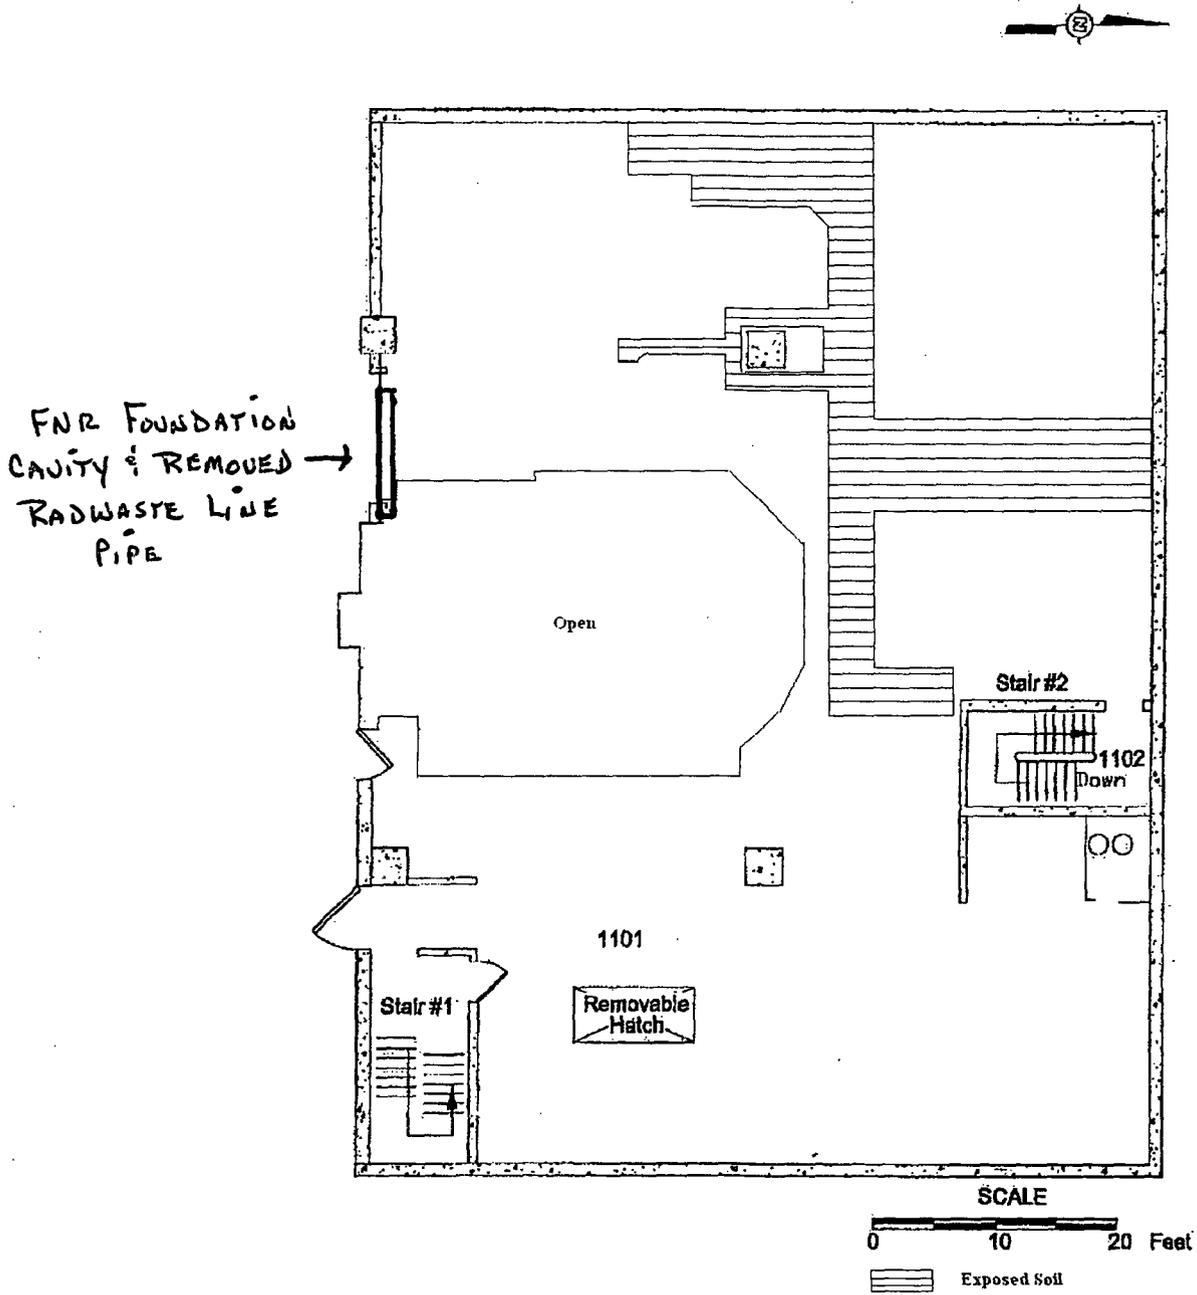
Floor Plan of the Ford Nuclear Reactor First Floor
